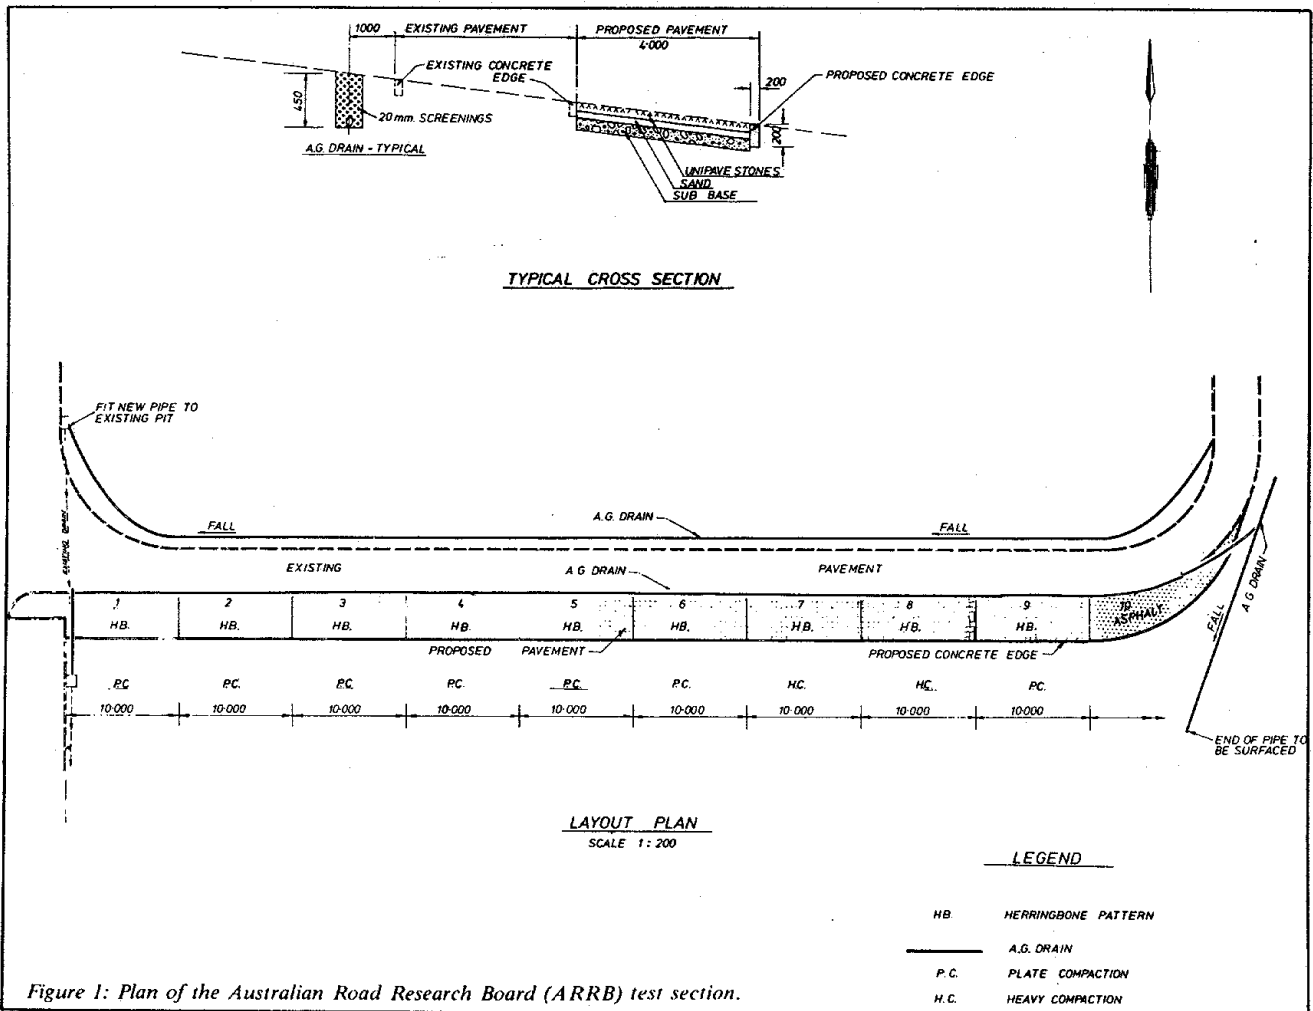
Plan of the Australian Road Research Board (ARRB) test section.
